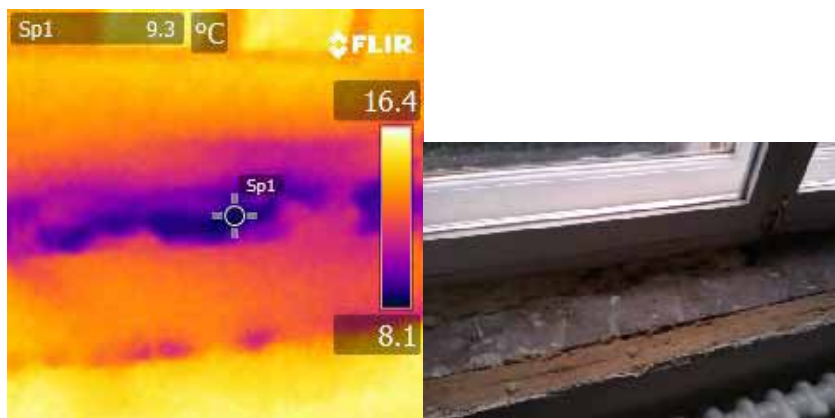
116 Abbeyforegate, Shrewsbury – first floor, south wall, window cill
